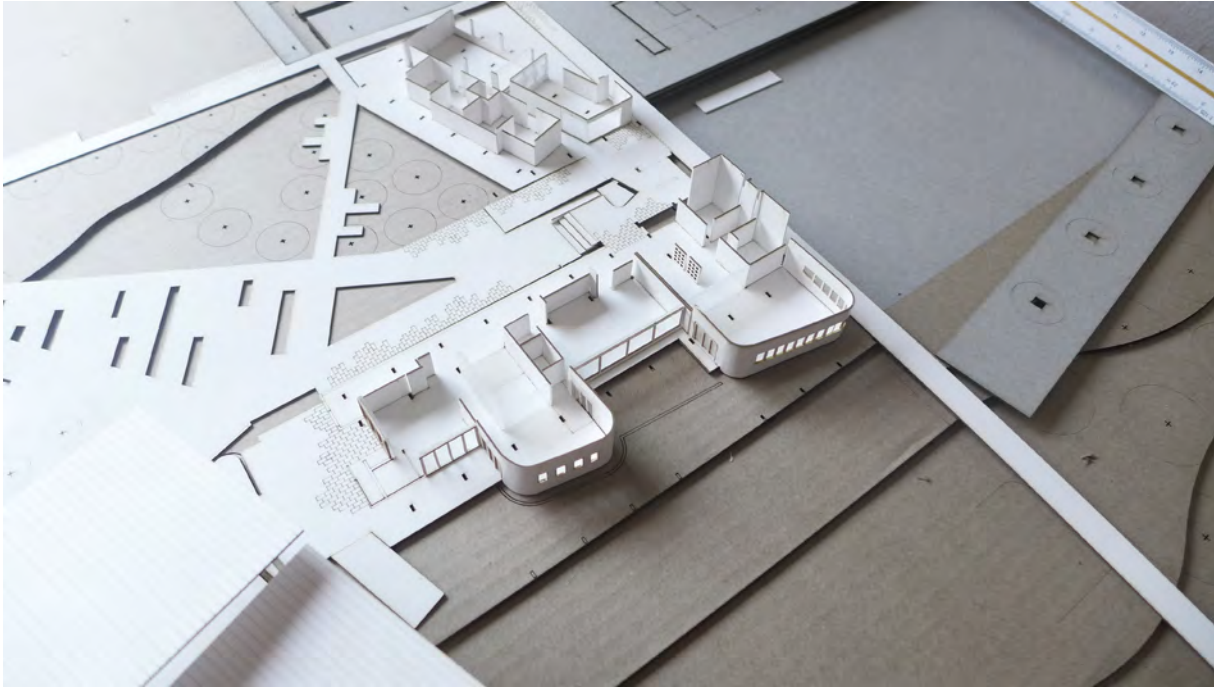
above: Ground floor view of model in process (Author, 2017).
